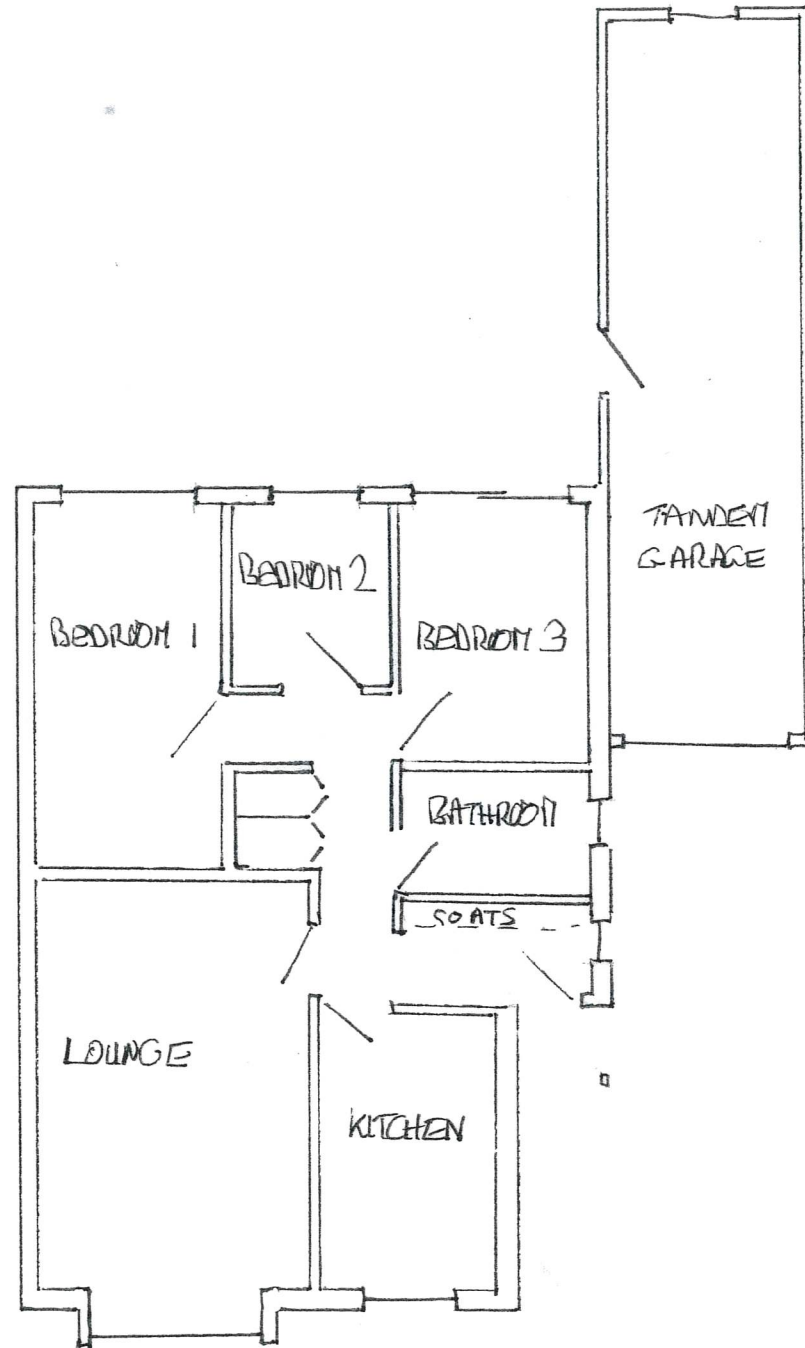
/2 Existing and Proposed Floor Plans
